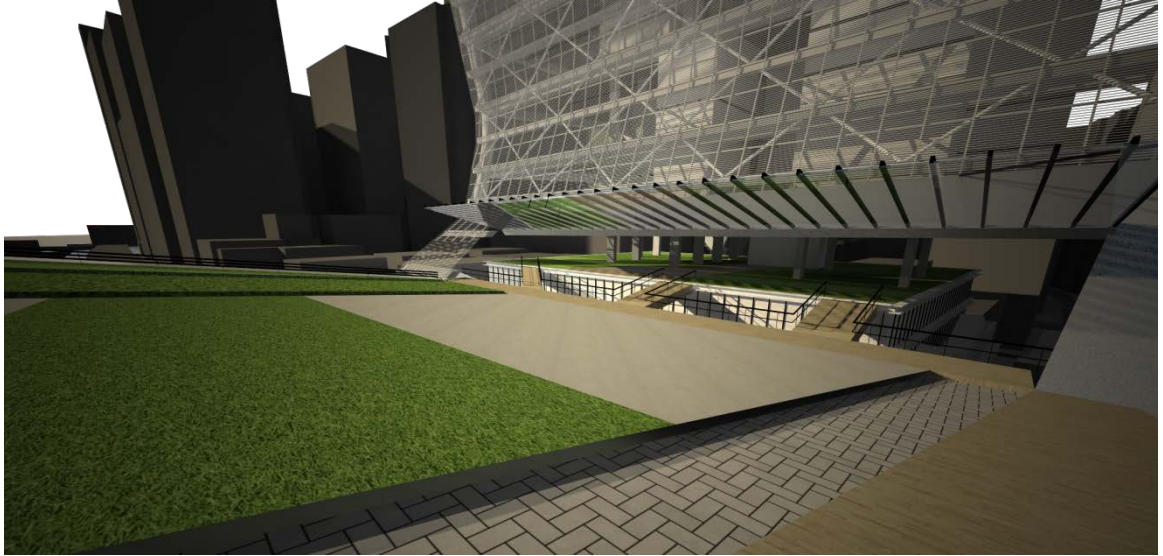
Connection Between Roof Plaza and Lower Floor of Apartment
